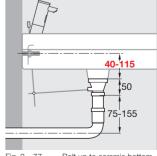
77 Bolt up to ceramic bottom edge 40–115
